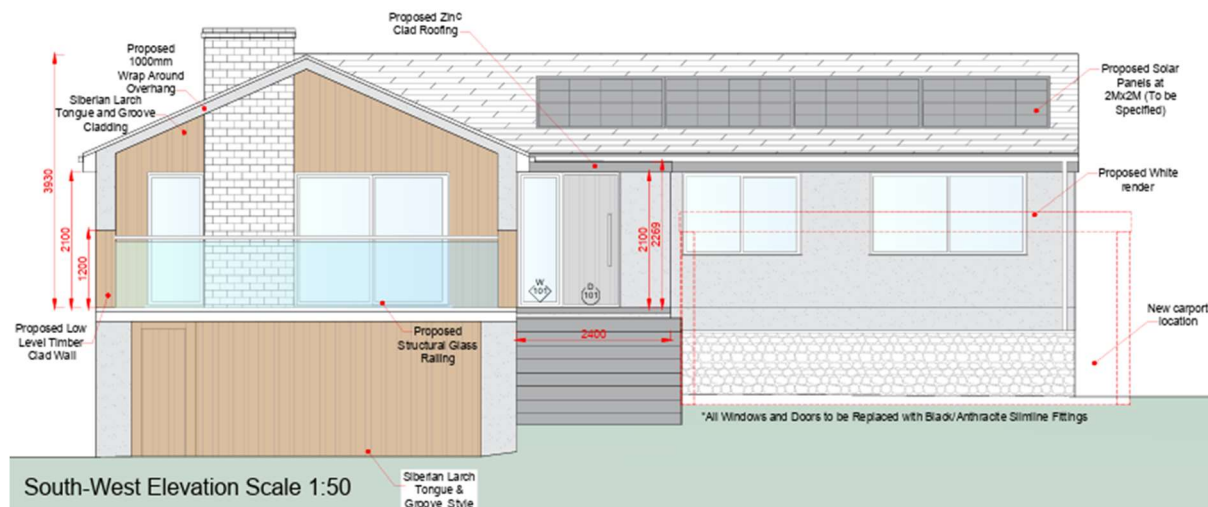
Proposed South West Elevation drawing, which is the elevation on the street scene
